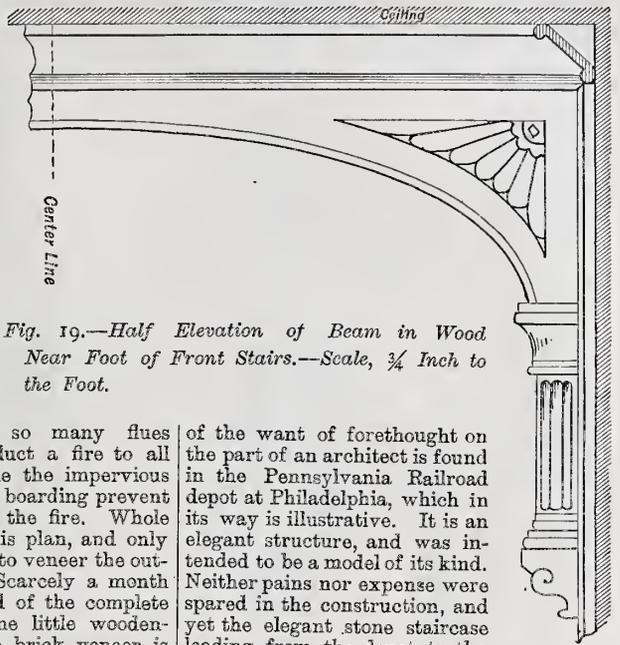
Half Elevation of Beam in Wood Near Foot of Front Stairs.—Scale, $\frac{3}{4}$ Inch to the Foot.
